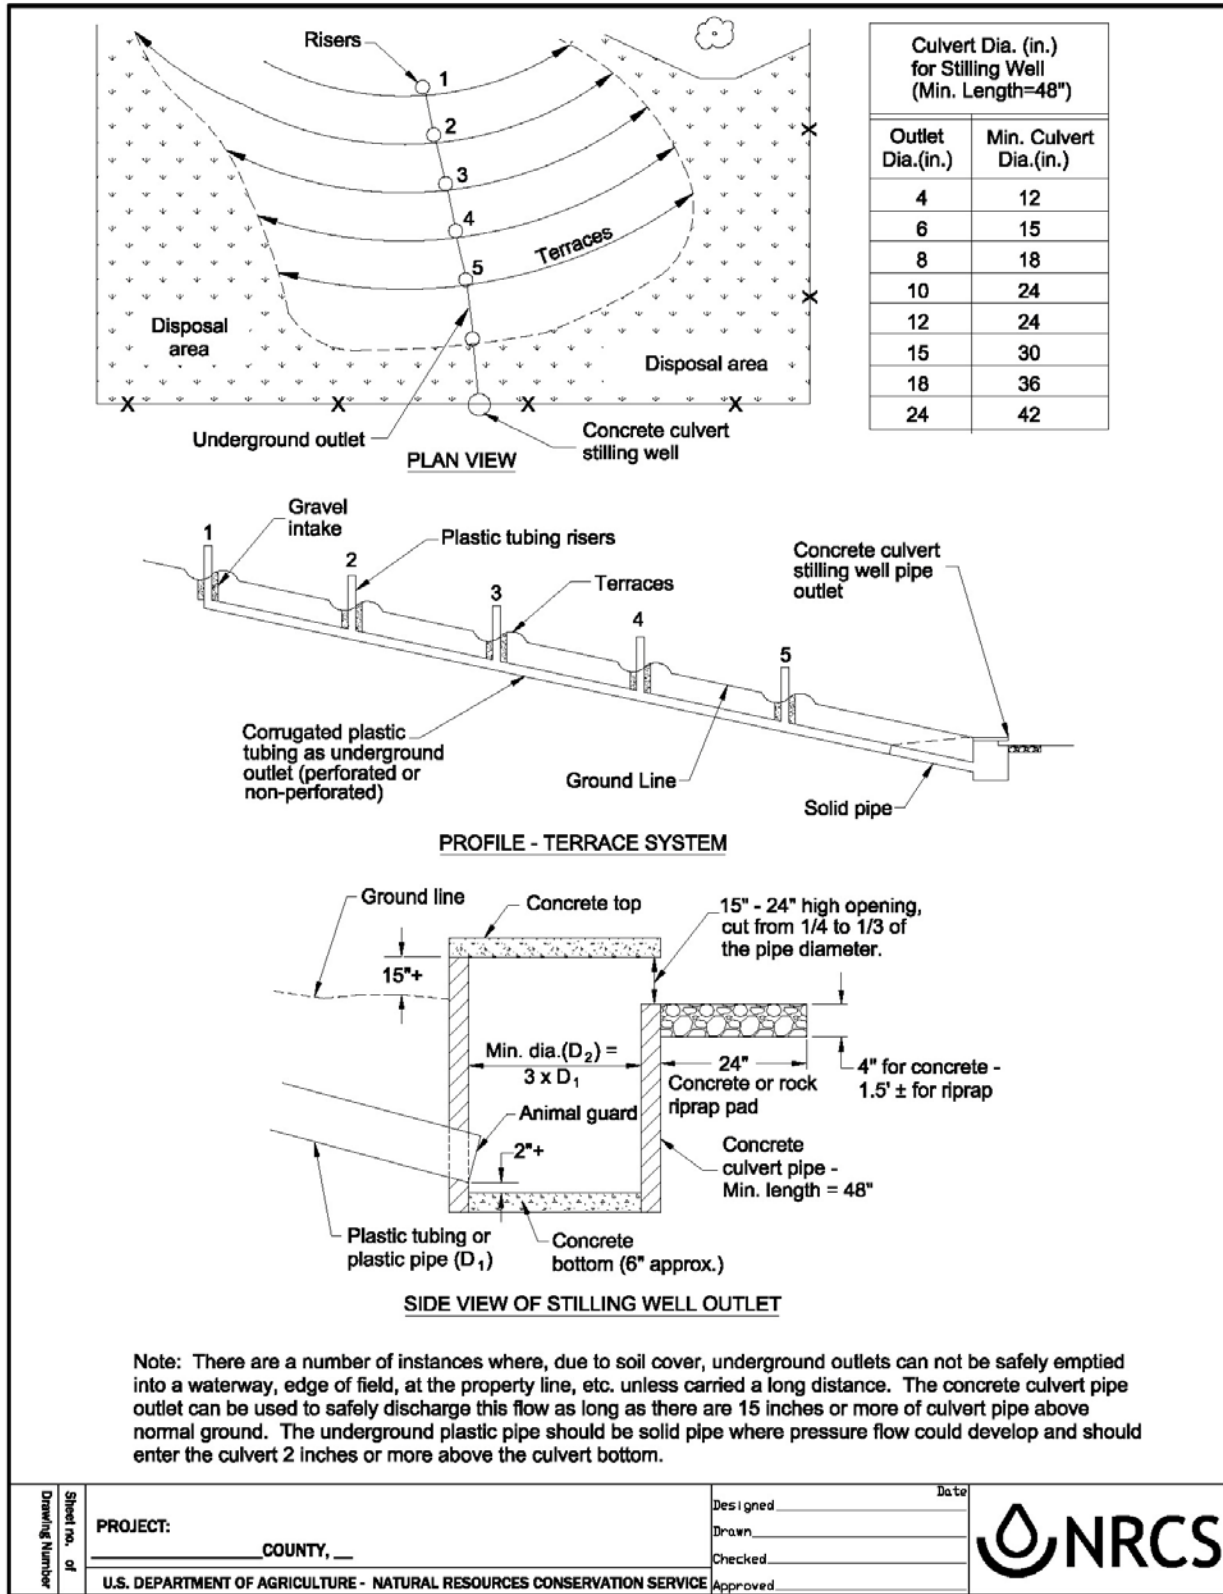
Concrete Culvert Stilling Well for Underground Outlet.
